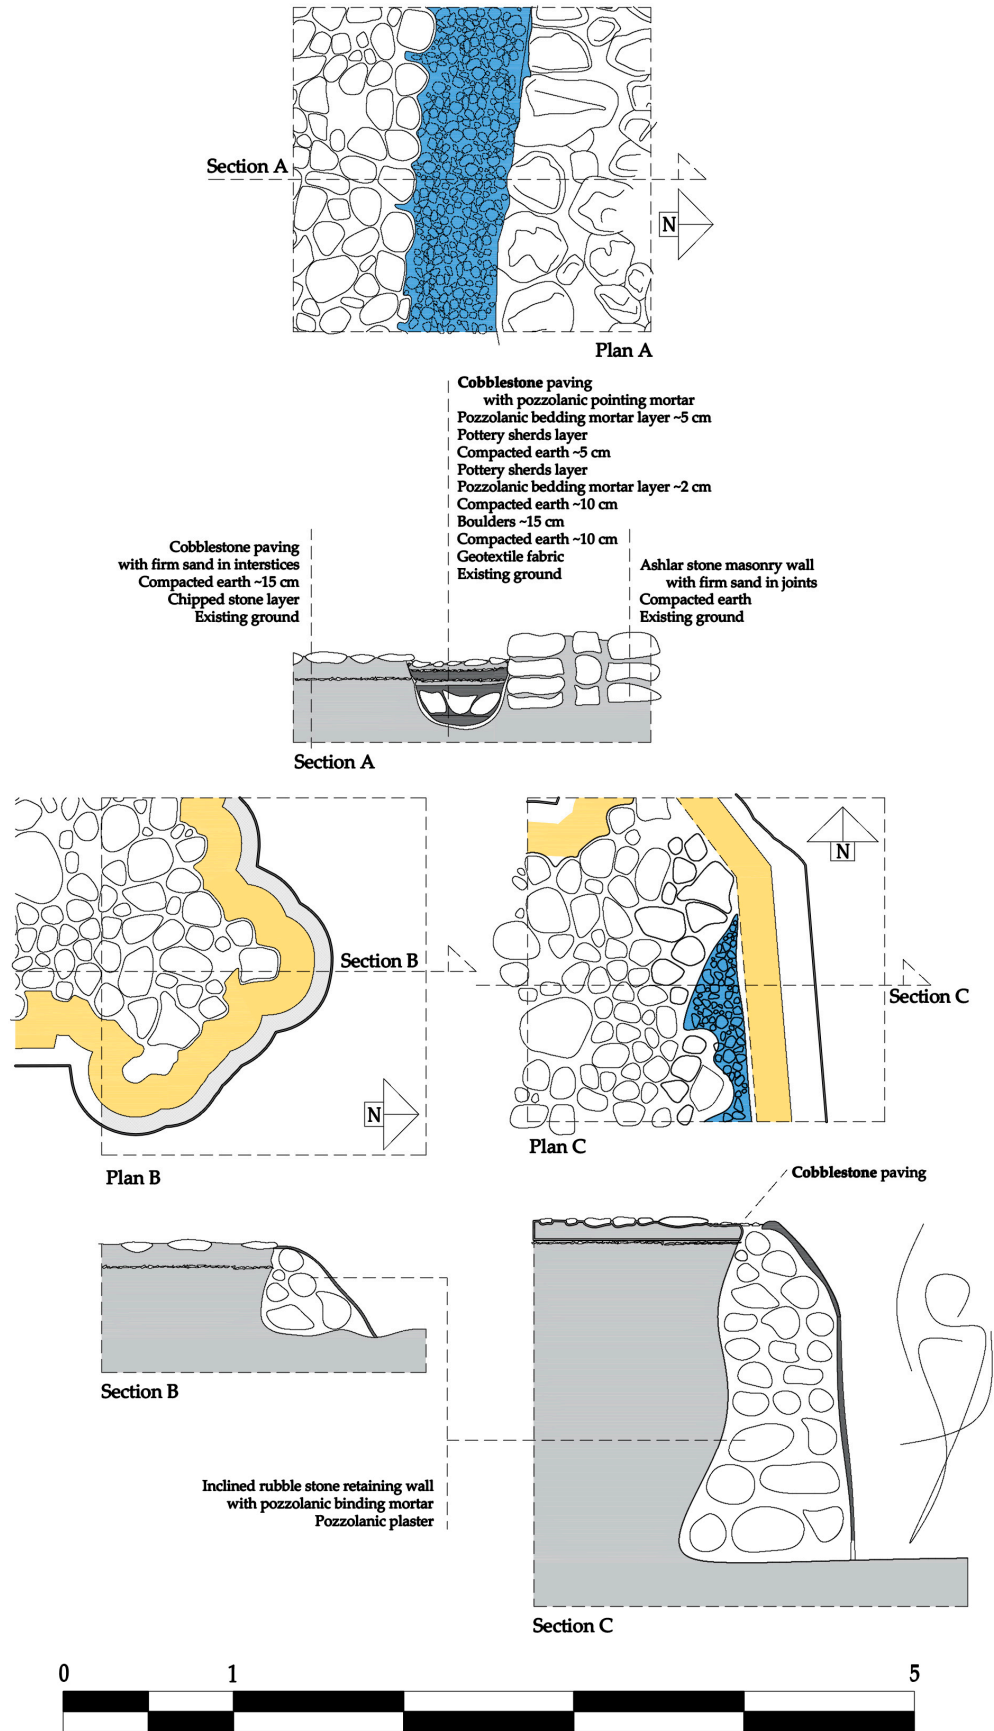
Repair details (Blue hatch stands for principal repair 1, infill and pavement; yellow hatch stands for principal repair 2, retaining wall construction. The color coding is consistent with Figure 3).
